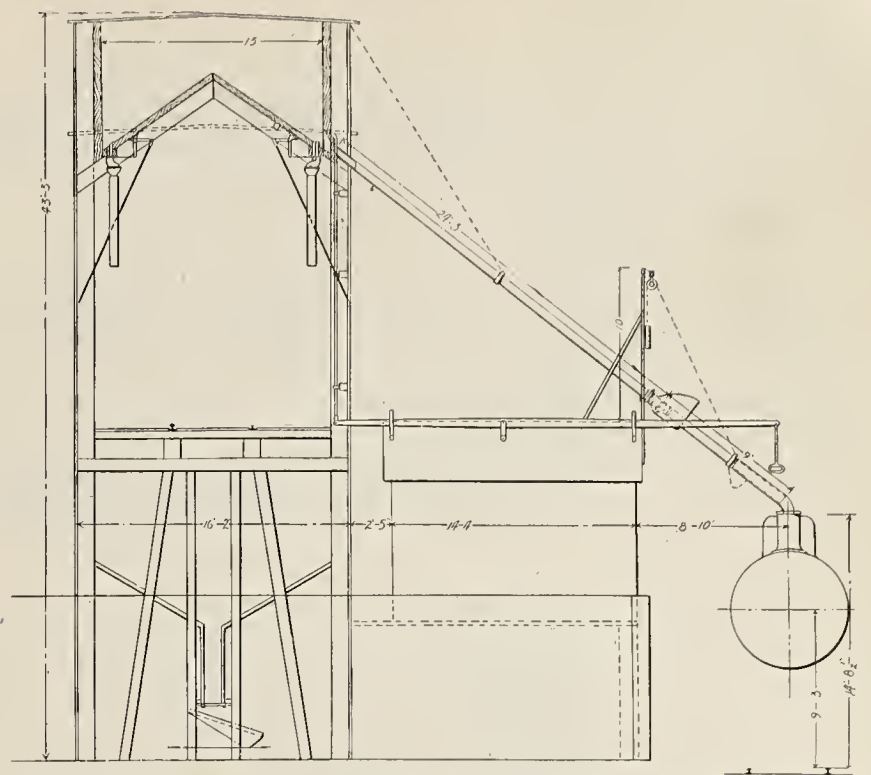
OPERATING MECHANISM CENTERVILLE SAND HOUSE, C. R. R. OF N. J.
